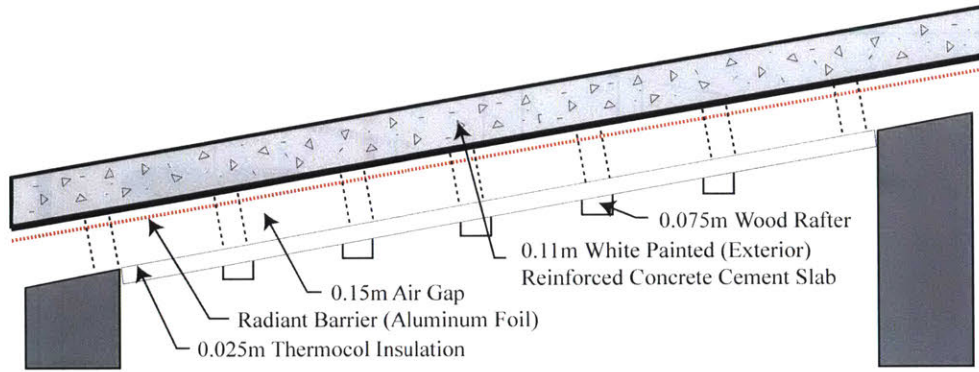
R3 | Reinforced Concrete Cement (RCC) Roof with Air Gap and Thermocol Insulation
